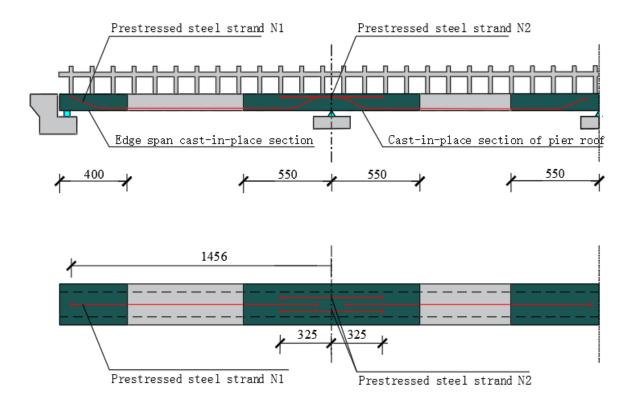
Prestressed steel strand layout diagram (unit: cm)
